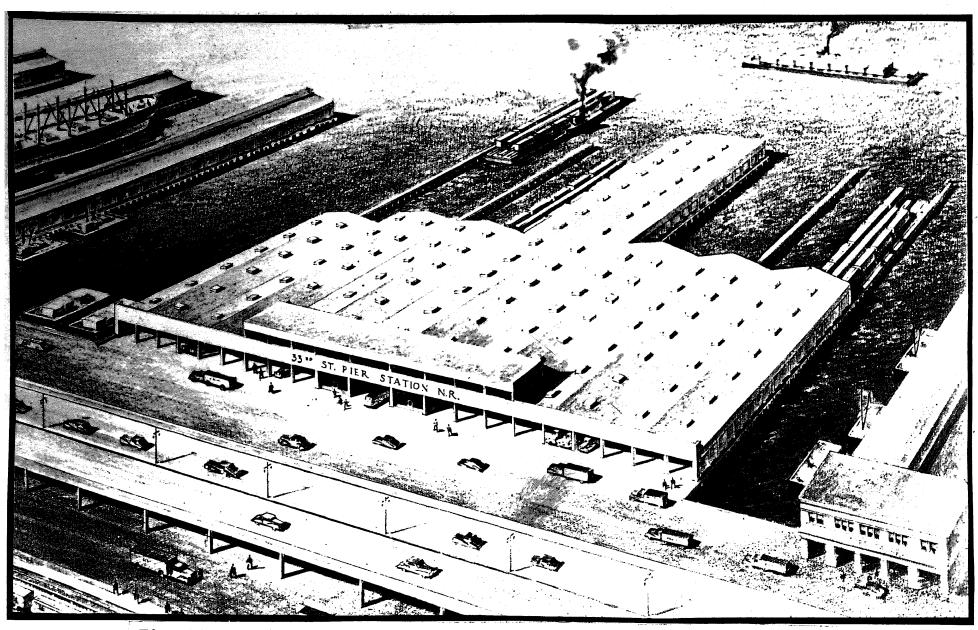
Proposed union carfloat station, foot of 33rd St., North River.
